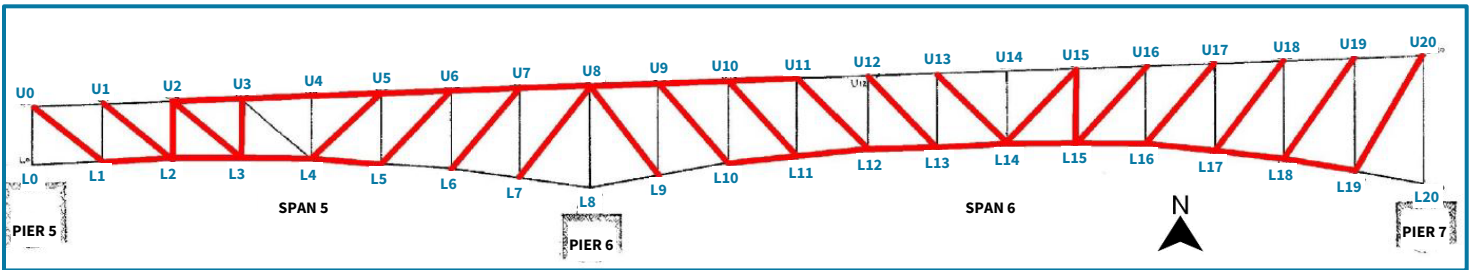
HAM-50-2180N Bridge Nomenclature (Truss Layout and NSTMs - Spans 5 to 6)
